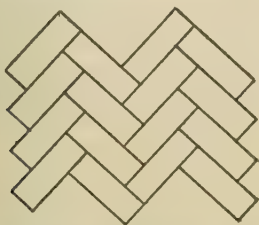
Method of laying floor of bricks on edge, or tiles, in herring-bone pattern
